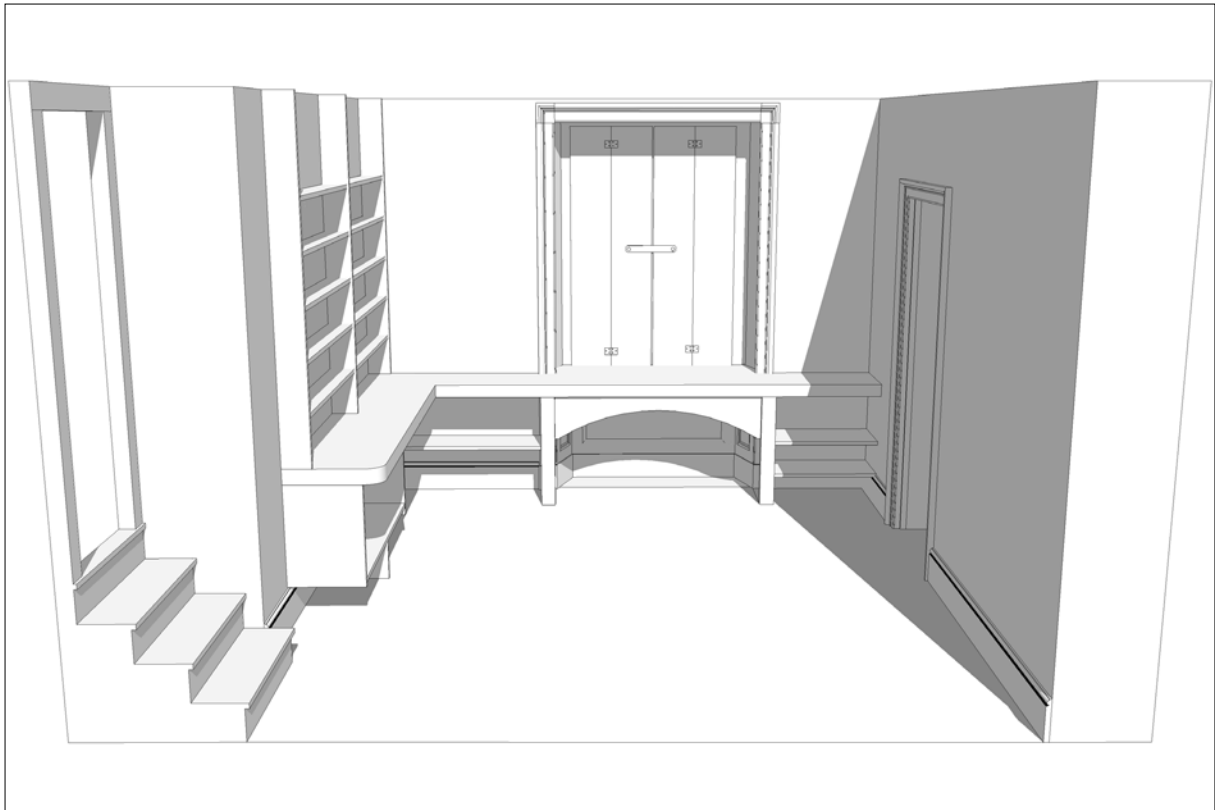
South office, north room - ground floor, showing shuttered window, counter and shelves. The left-hand doorway leads to the warehouse
